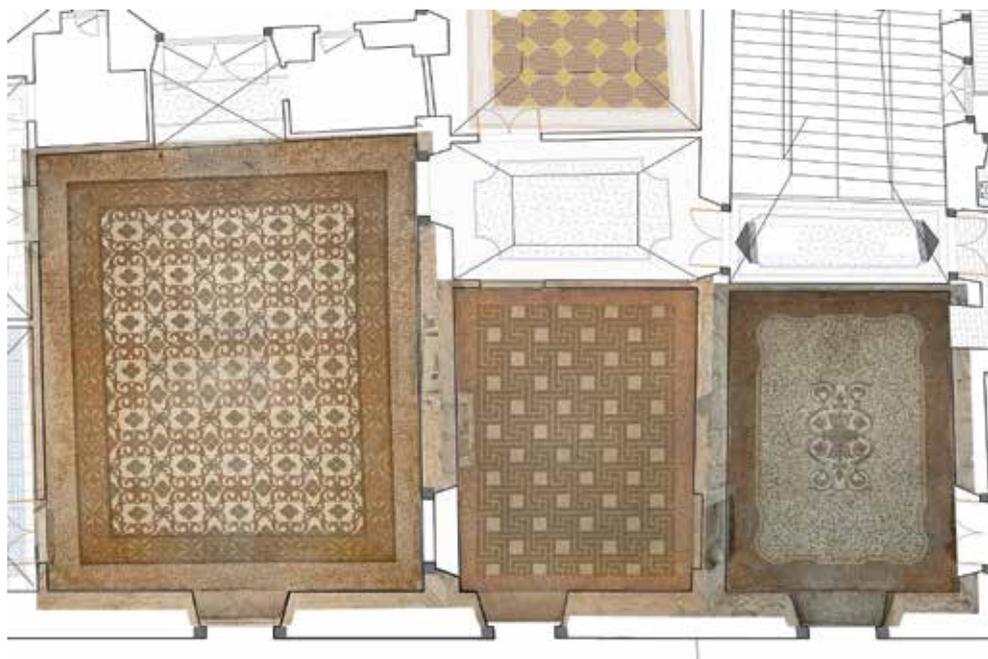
Plan of the three Venetian floors (illustration R. Cassio)
